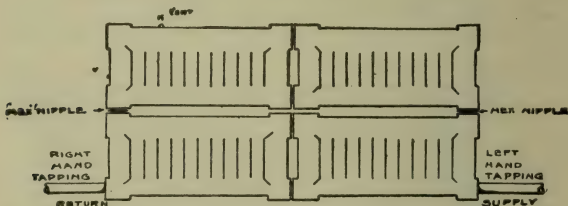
Assembled Four Horizontal Sections in Two Tiers Water.
